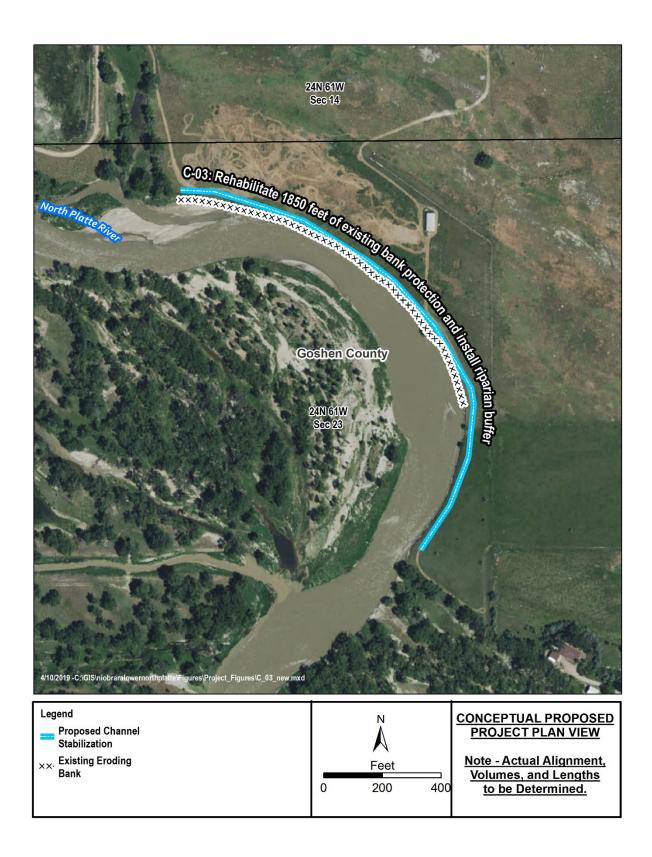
Proposed C-03: North Platte River Bank Erosion Downstream of US Highway 85.
